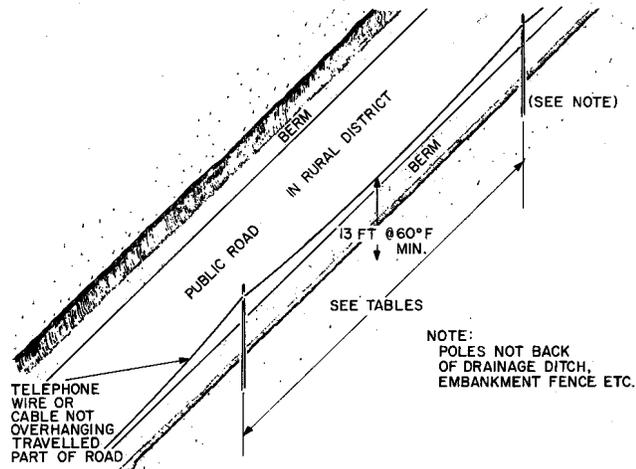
Wire Running Along, But Not Overhanging Public Roads (Not Back of Obstruction)
